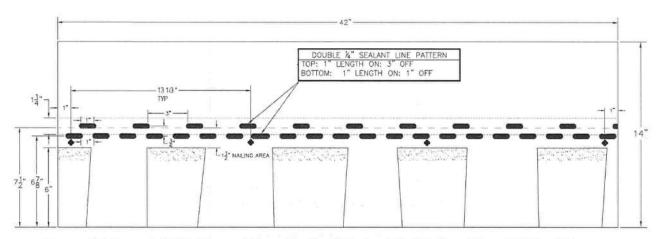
Pinnacle® Pristine and StormMaster® Shake 4 Nail Pattern (Non-HVHZ only)
